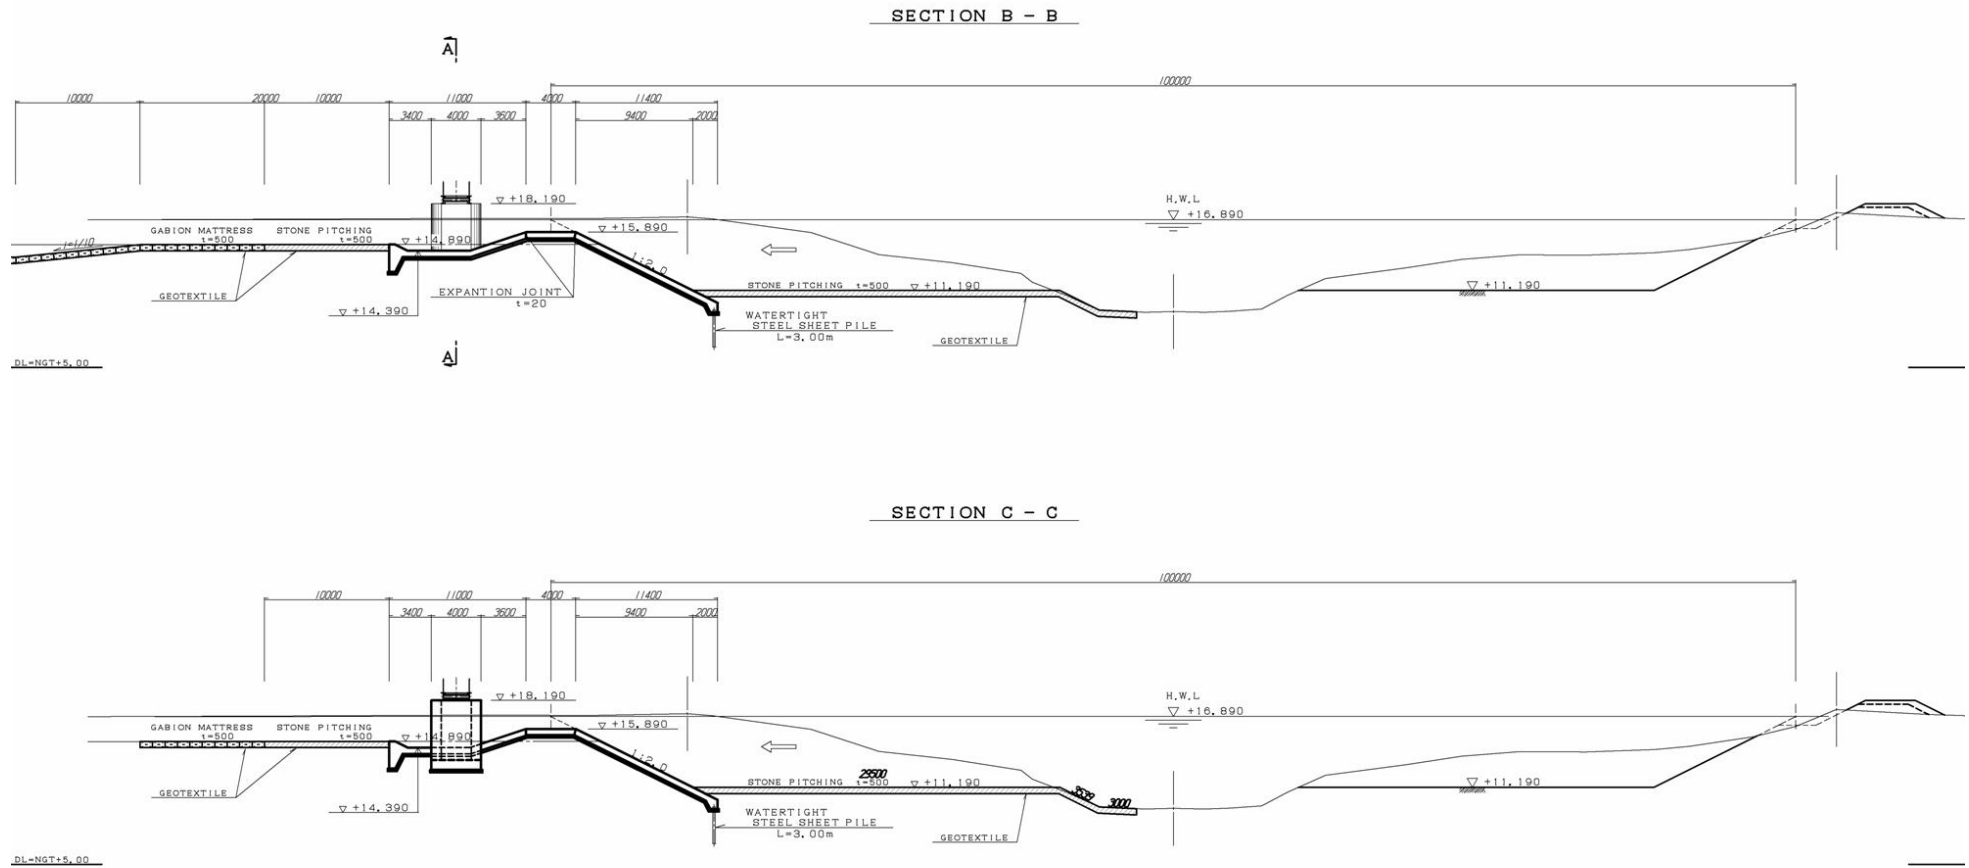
B-B and C-C Cross Sections of Split Flow Weir to Flood Control Basin
